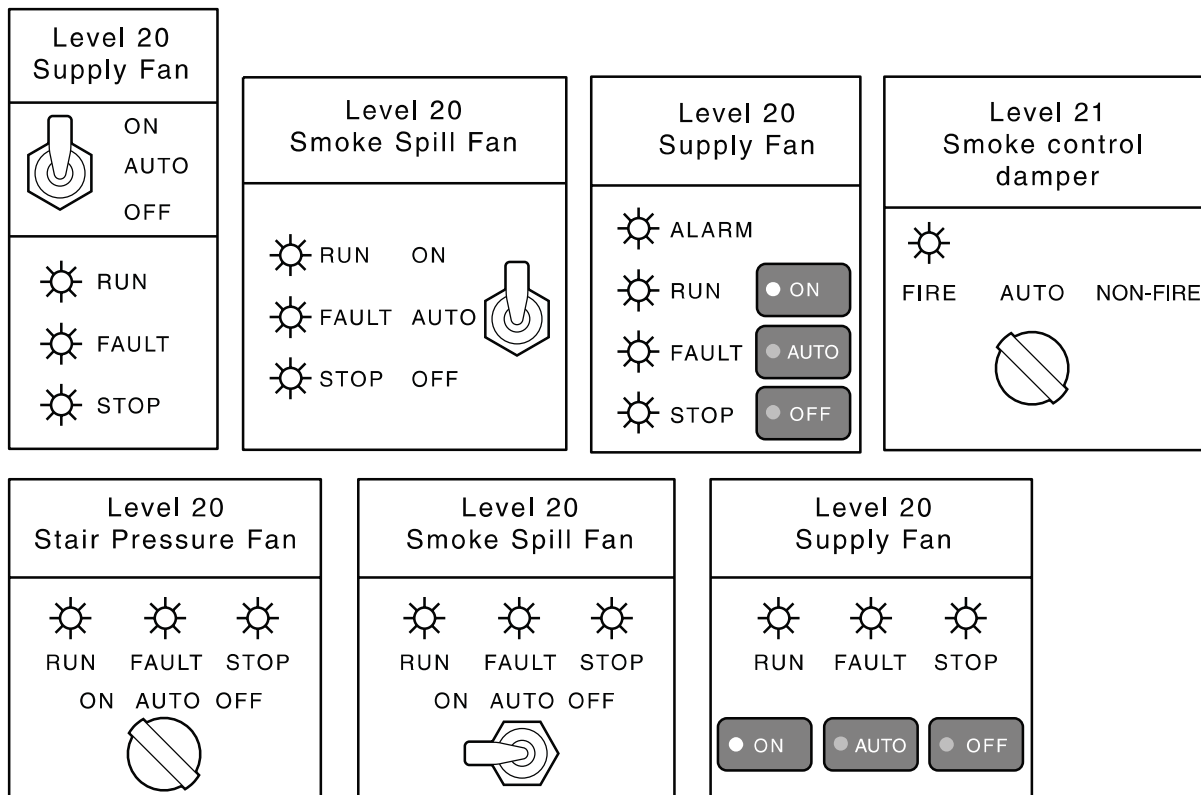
Examples of typical FFCP indicators and override control layout
